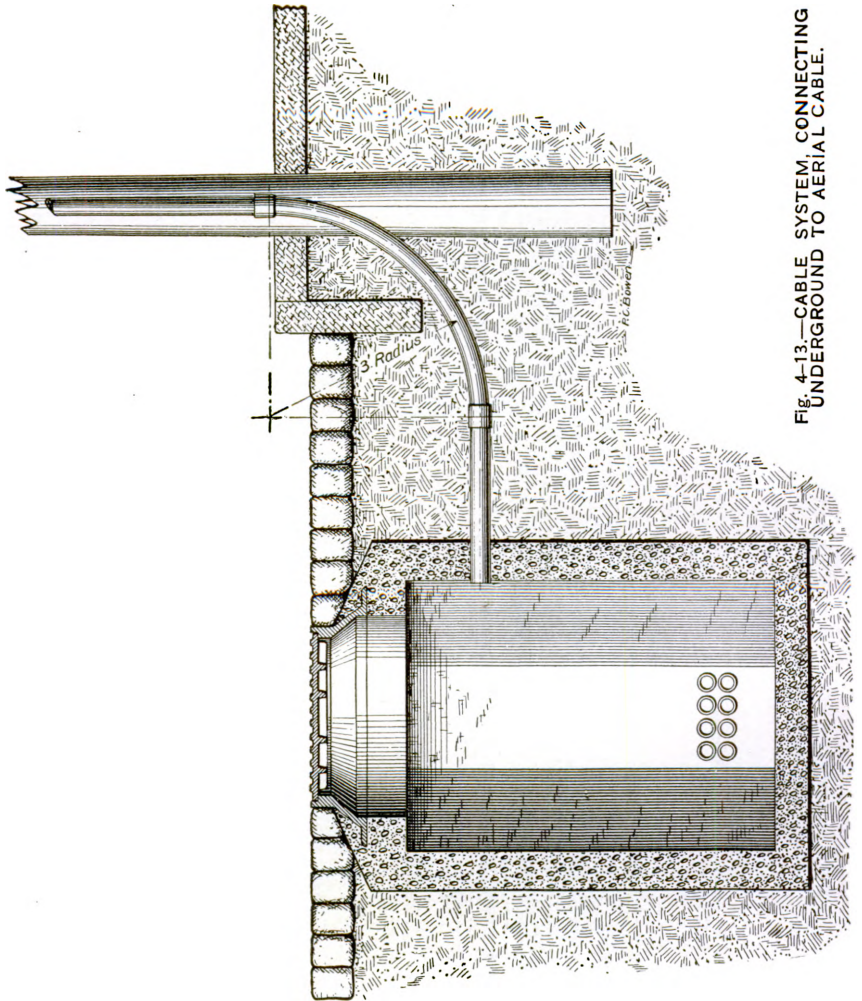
CABLE SYSTEM, CONNECTING UNDERGROUND TO AERIAL CABLE.
